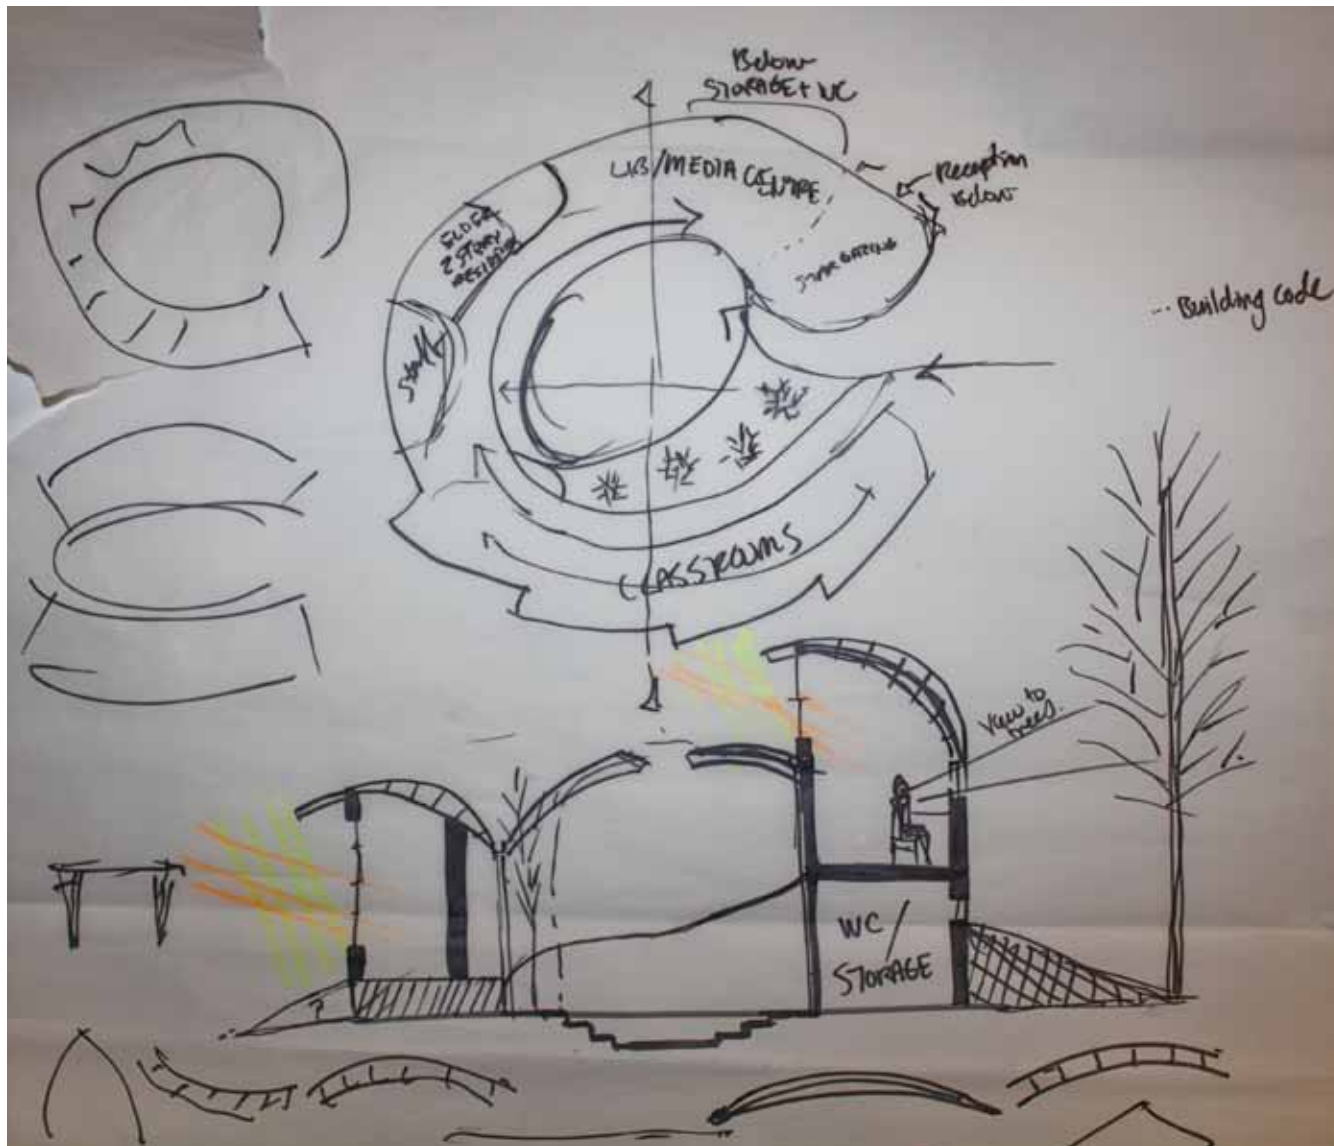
Second iteration: now north portion of building is two-storeys, exploring banana truss roof structure and ramped corridor around gathering space
